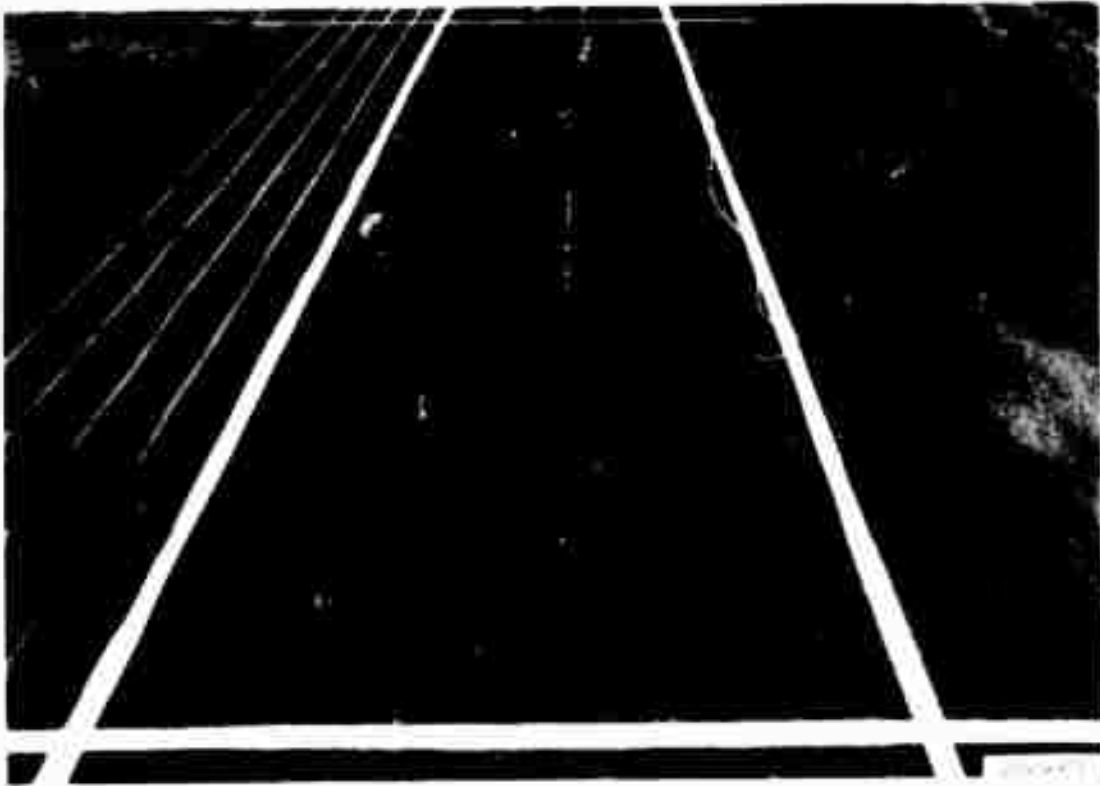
Item 2, lane 2, flexible pavement test section, prior to traffic
